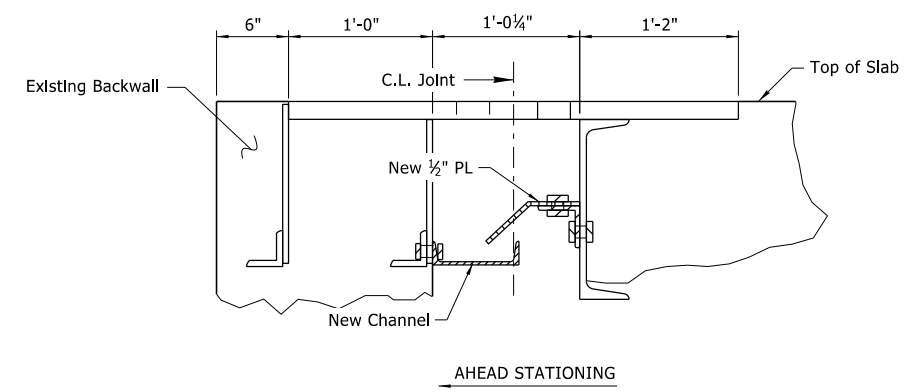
DETAILS OF JOINTS AT PIER 4 AHEAD STATIONING
